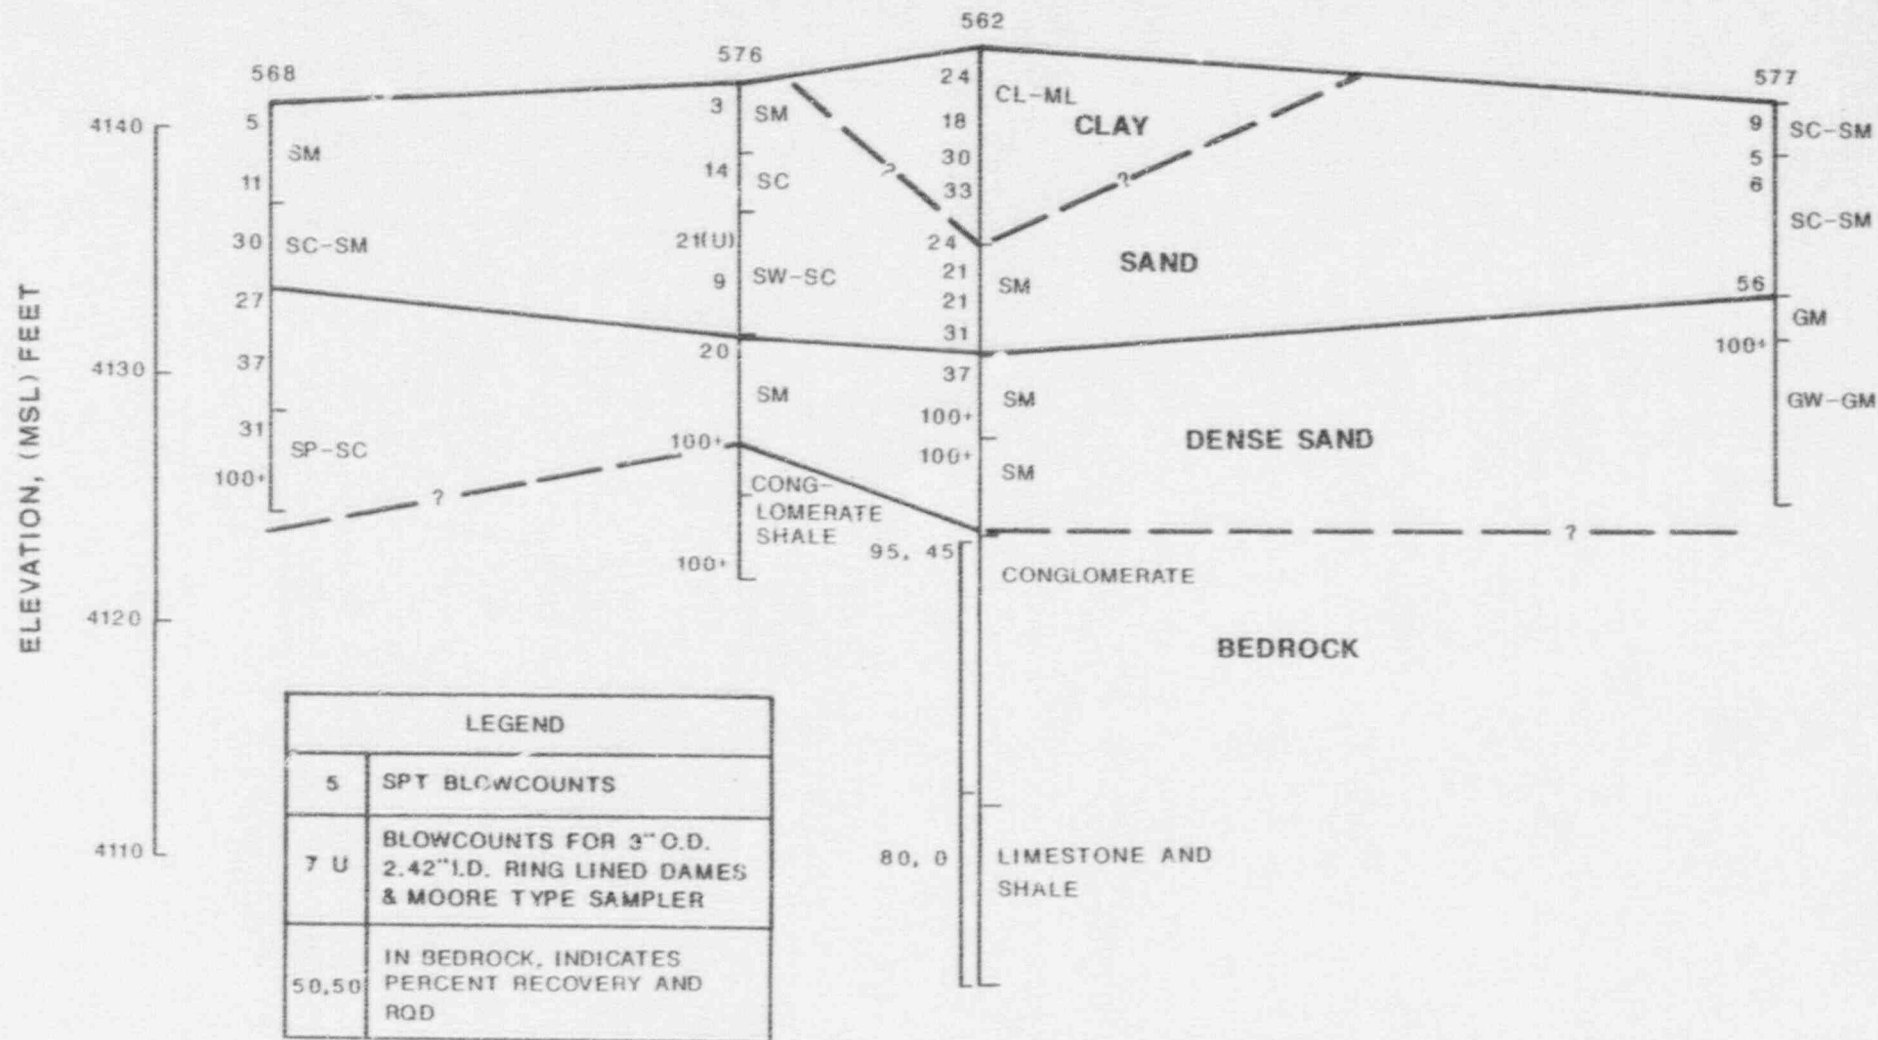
GREEN RIVER SITE CROSS SECTION B - B'
